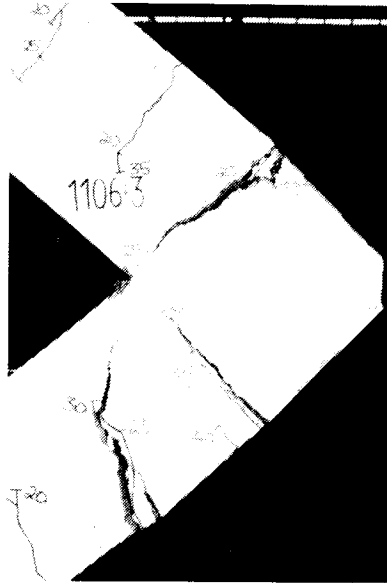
Crack pattern of a test specimen (specimen RV3) carried out with the conventional reinforcement detailing, Plos (1994a, b).
